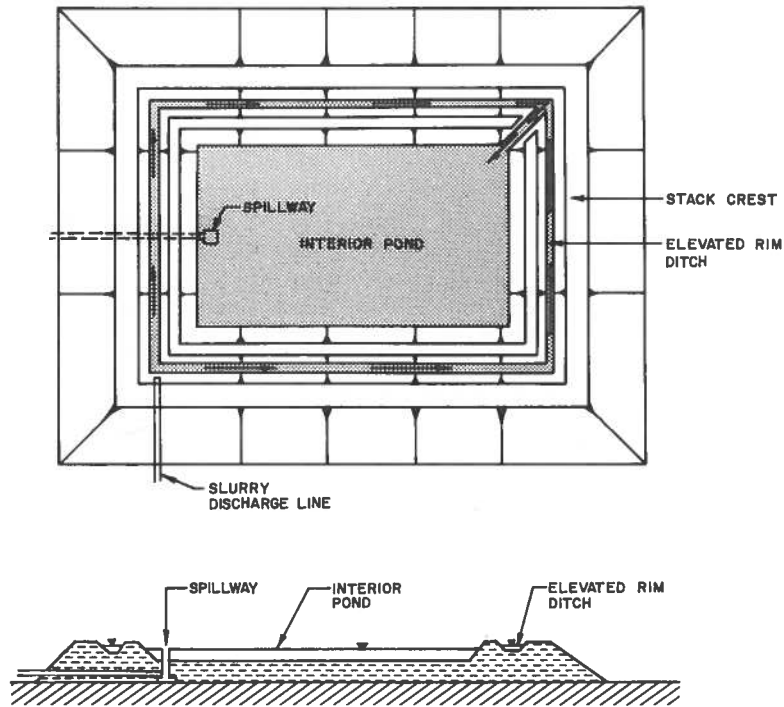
Typical Gypsum Stack Layout Illustrating Elevated Rim Ditch.
